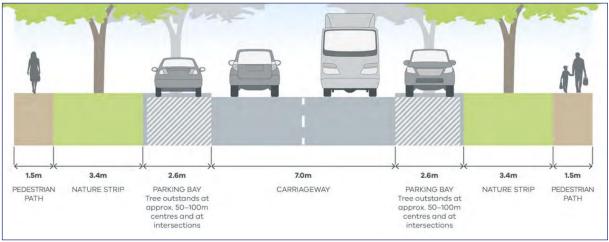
Typical PSP Industrial Local Access Street – Level 2 Cross-Section (22m Wide)
